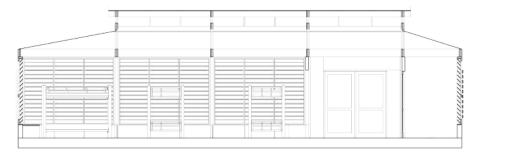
Proposed Cabin, Longitudinal Section (NTS) (by author, 2010)
